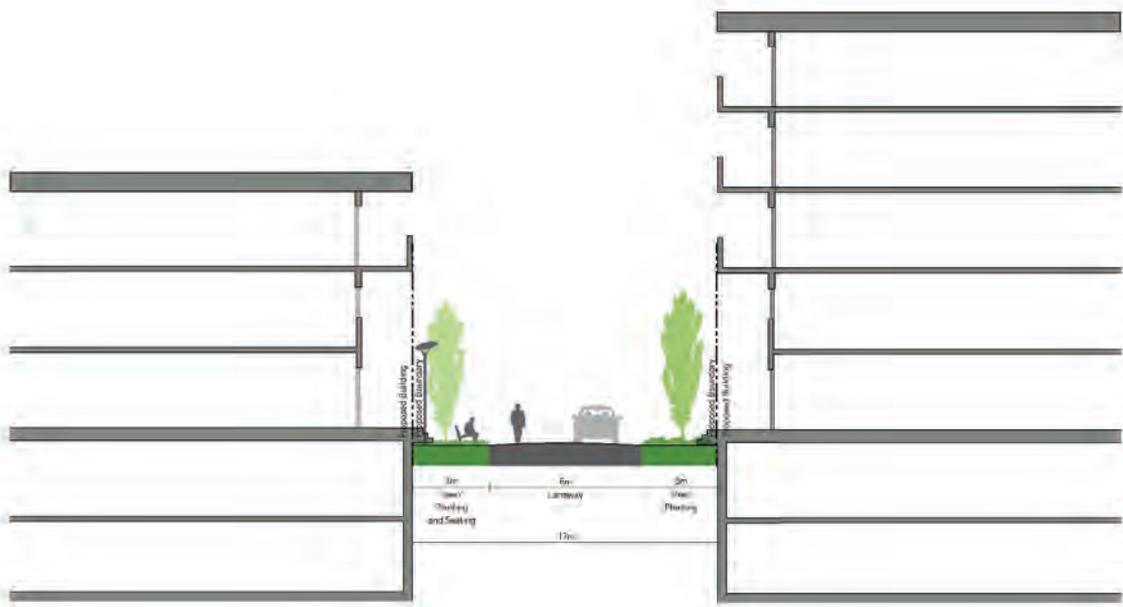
Indicative Street Section (Through site Link, min. 8m)
